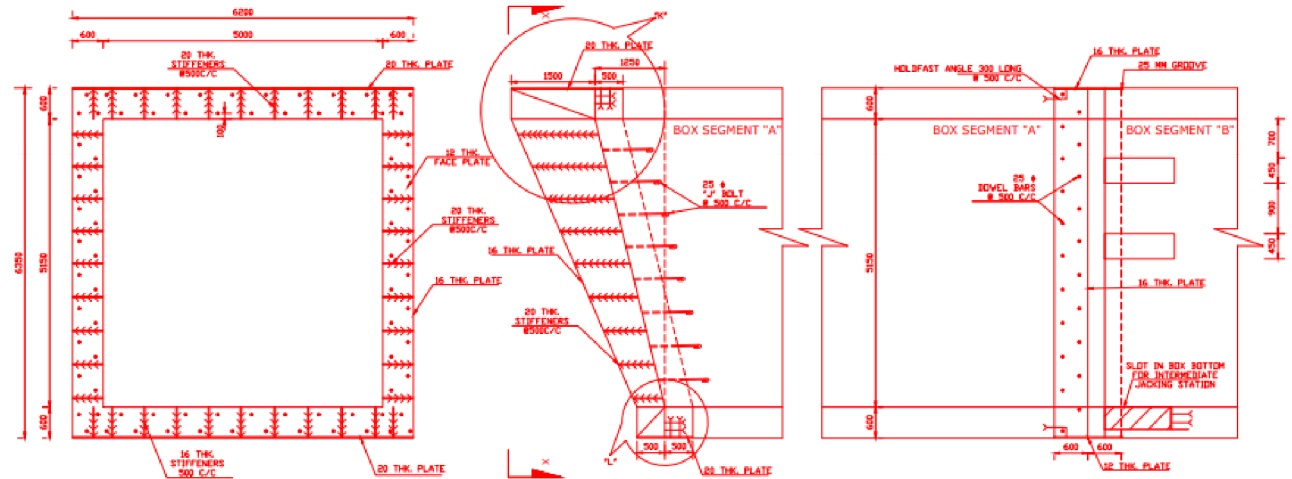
# DETAIL DRAWING DESCRIPTIONS: SHEETS 2 & 3 OF 4
